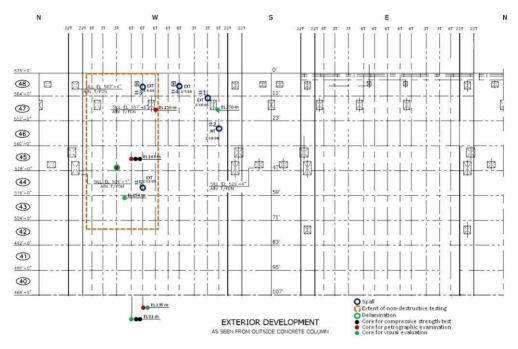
Locations of spalling (#1 - #5), delamination, non-destructive testing and coring (Note: only top 143 m shown for clarity).
